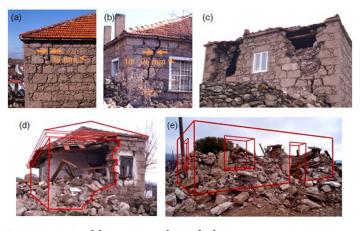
Building examples of the masonry structure according to the degree of damage: slightly damaged (a), moderately damaged (b), heavily damaged (c), partially collapsed (d), and completely collapsed (e).
